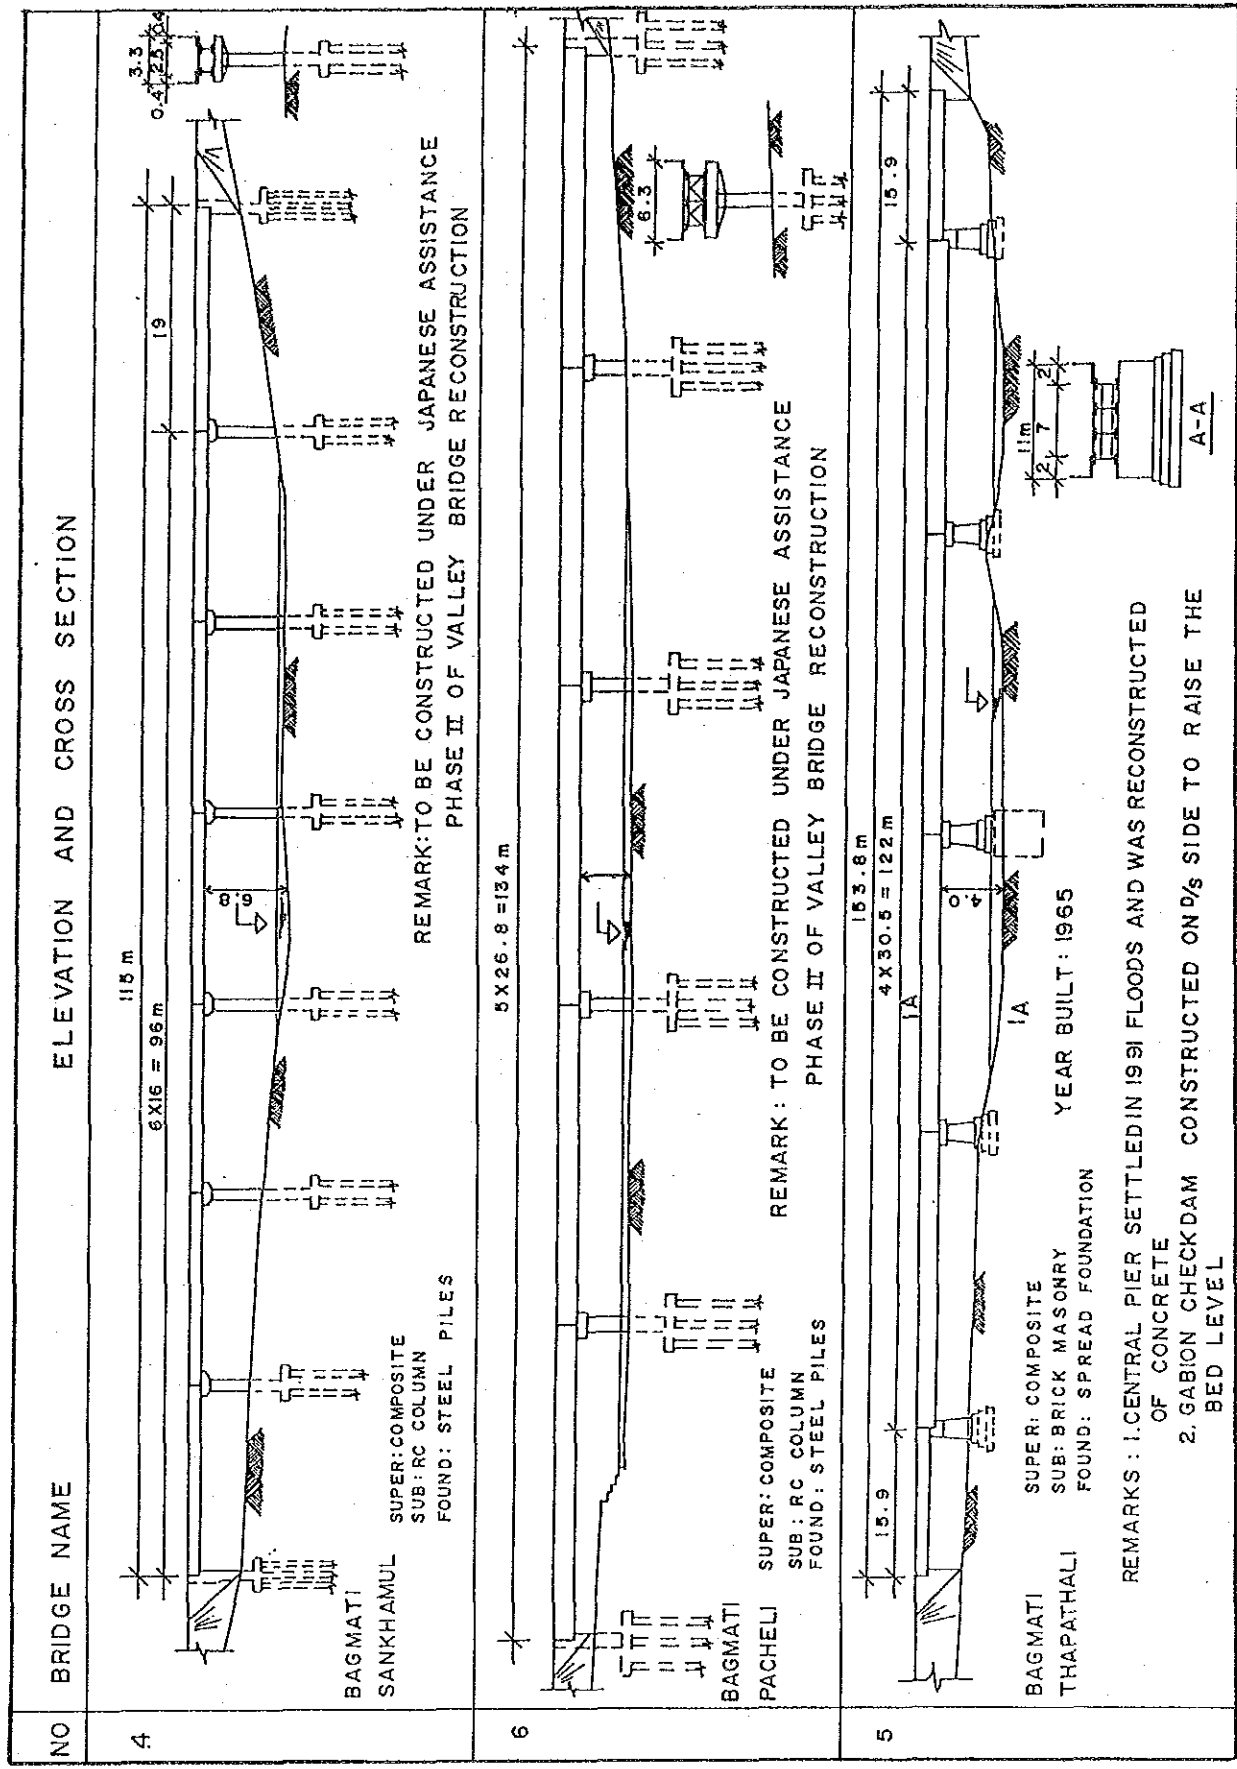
SKETCHES OF EXISTING AND PLANNING BRIDGE 2/4
